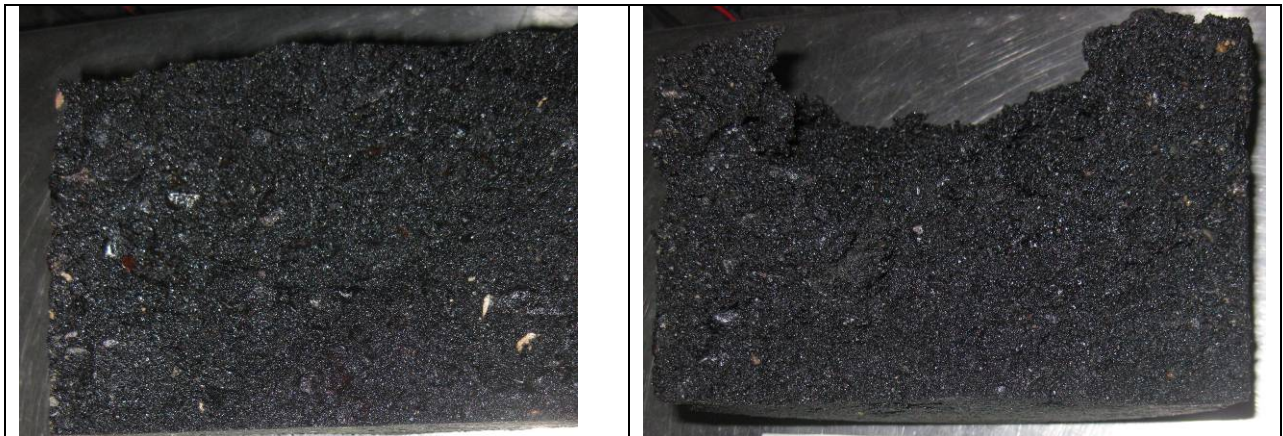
7% and 14% Air Void Specimens (left and Right) *after* Modified Boiling Test
